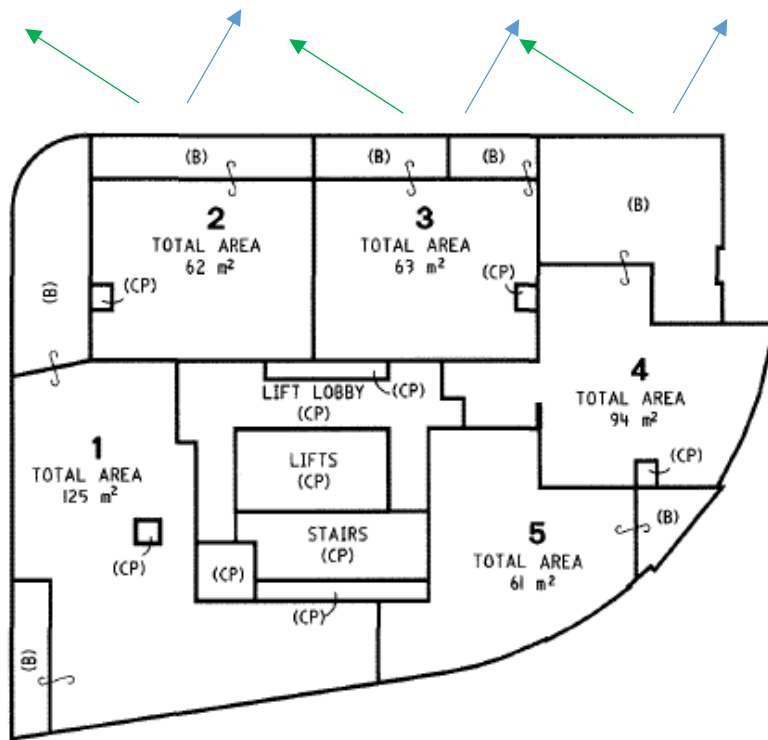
Strata Plan layout of Level 2, at 417-419 Bourke Street, Surry Hills
